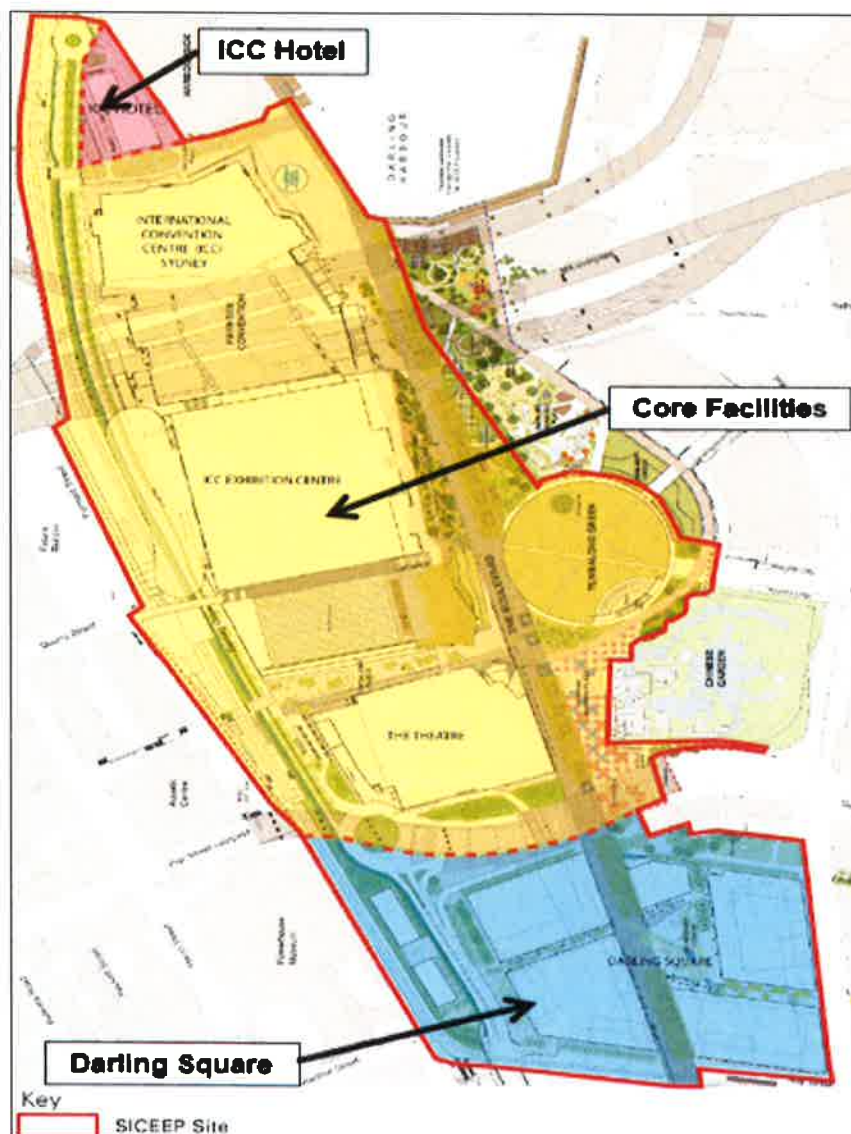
SICEEP master plan (Source: Applicant's EIS)
